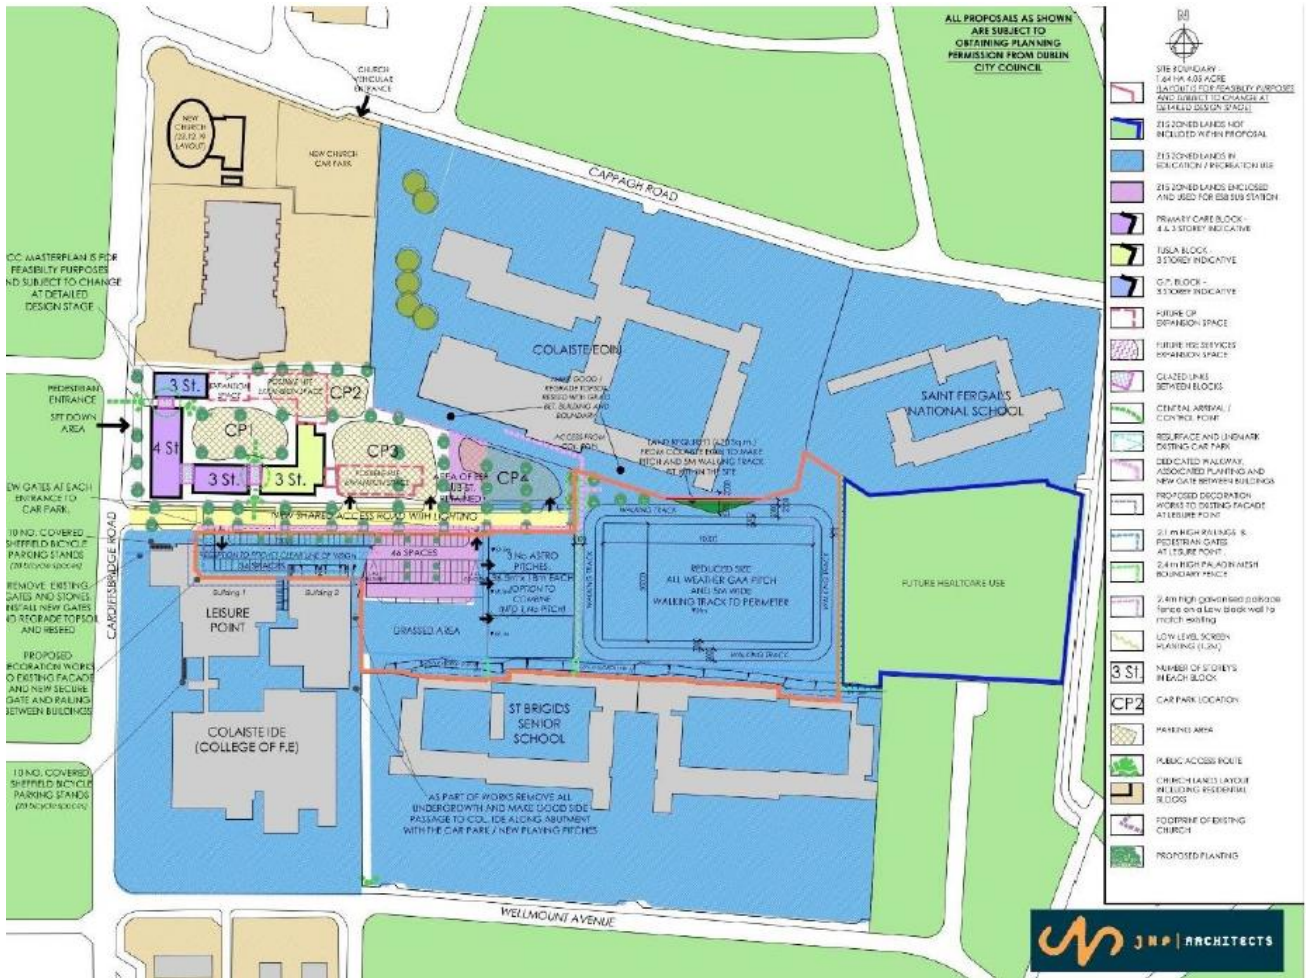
Layout Plan of Final Feasibility of Primary Care Centre and Recreation Facilities (Source: DCC, HSE, CDET, Archdiocese of Dublin)
